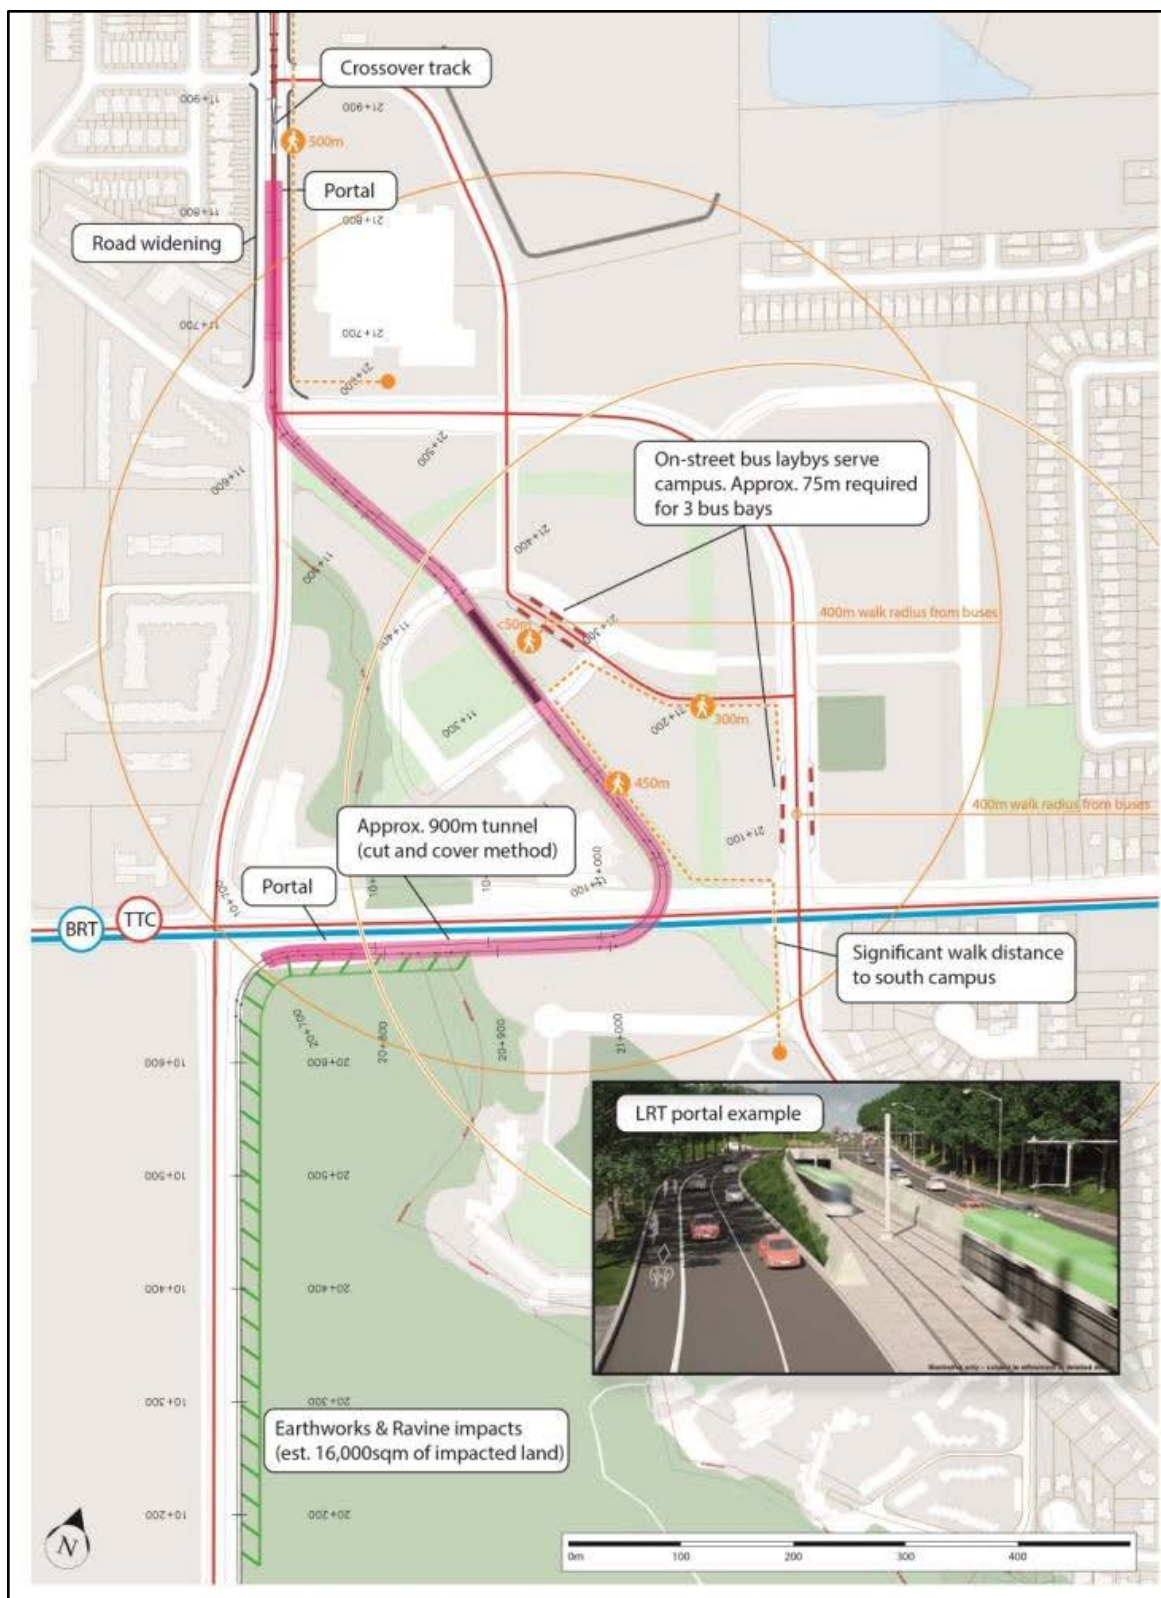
Campus Tunnel Concept (Street and Block pattern as articulated by the proposed UTSC Secondary Plan)
